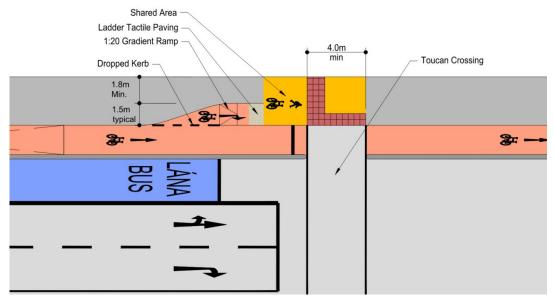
Preferred Cyclist Waiting Area Detail at Toucan crossing
